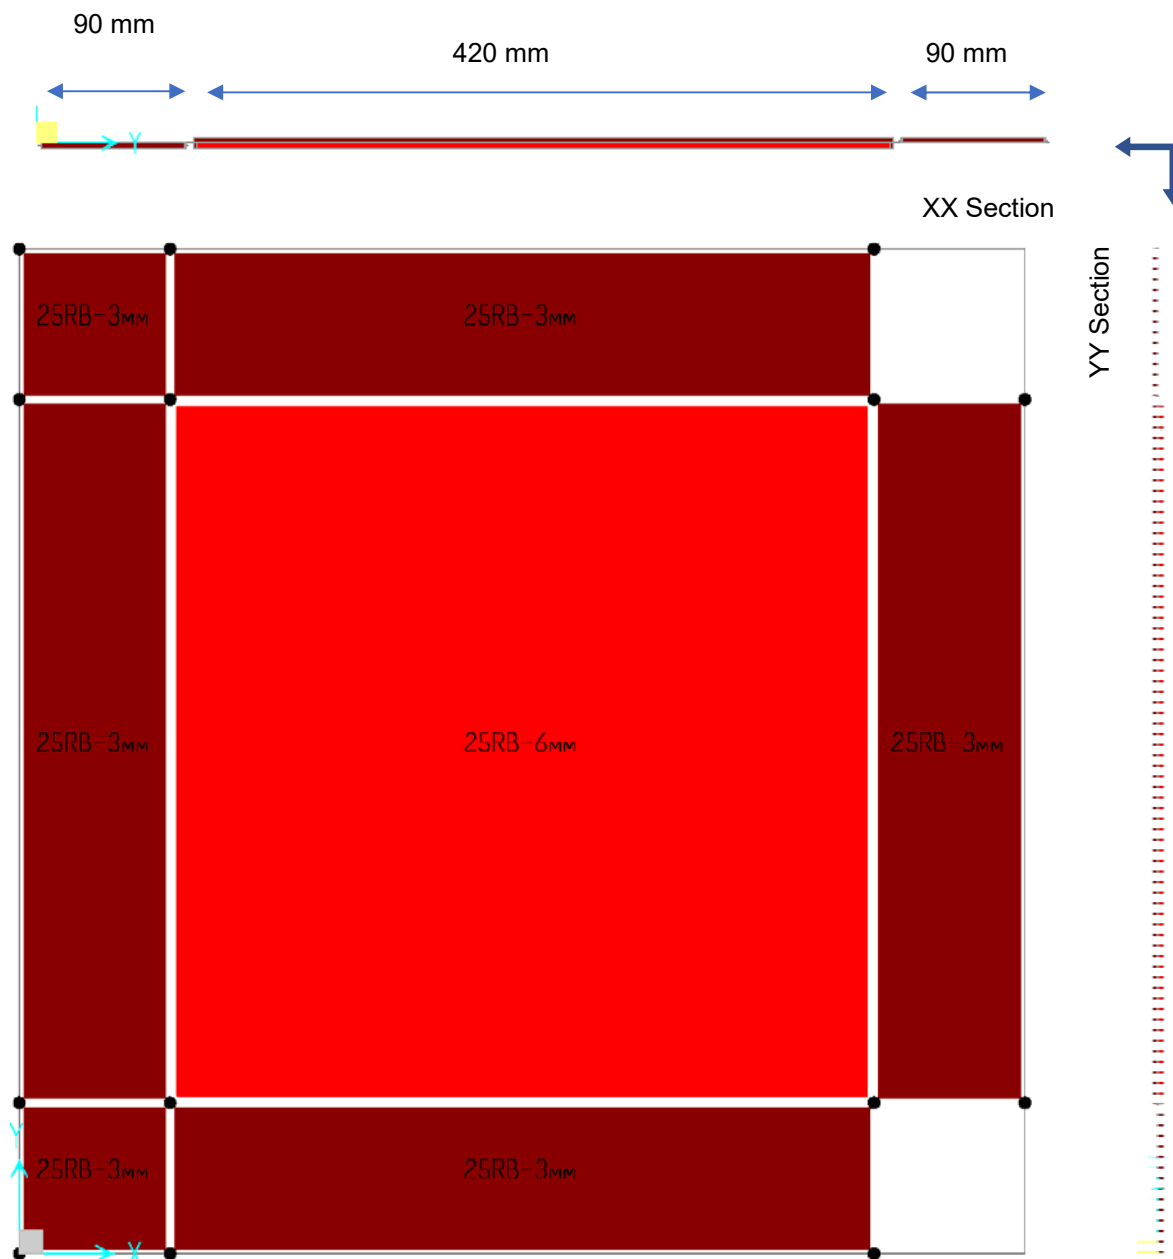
SAP Model Dimensioning & Layout (Plan & Sections)
